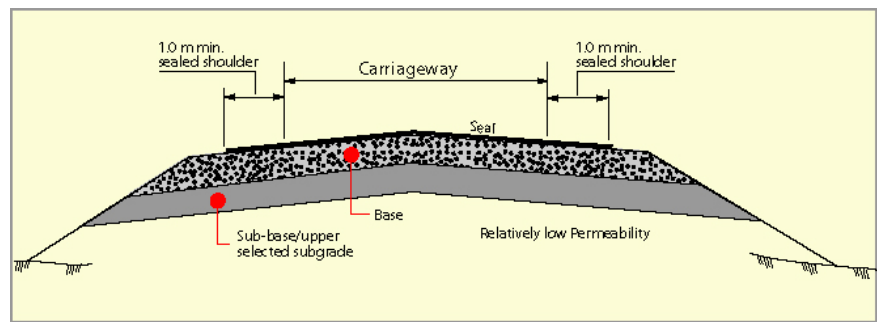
Pavement configuration for Zone A materials (unprocessed, unbound materials)
